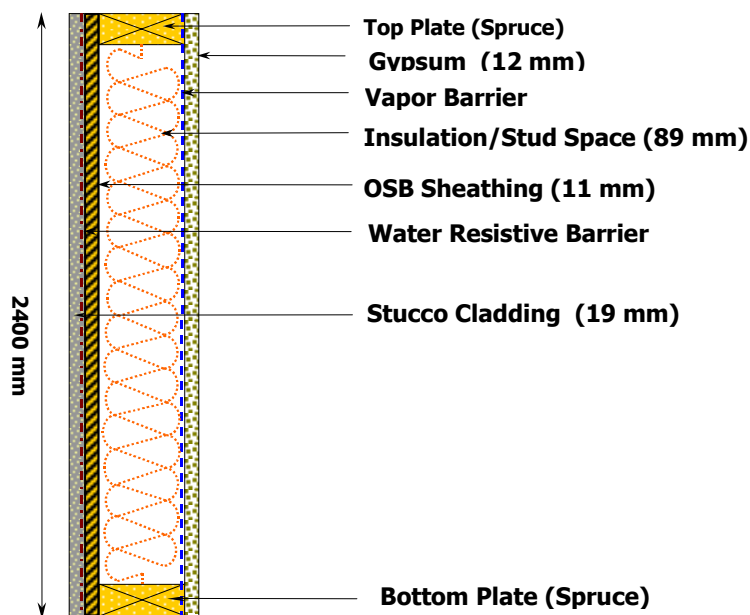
Basic wall design selected for parametric studies of stucco-clad wall assemblies
